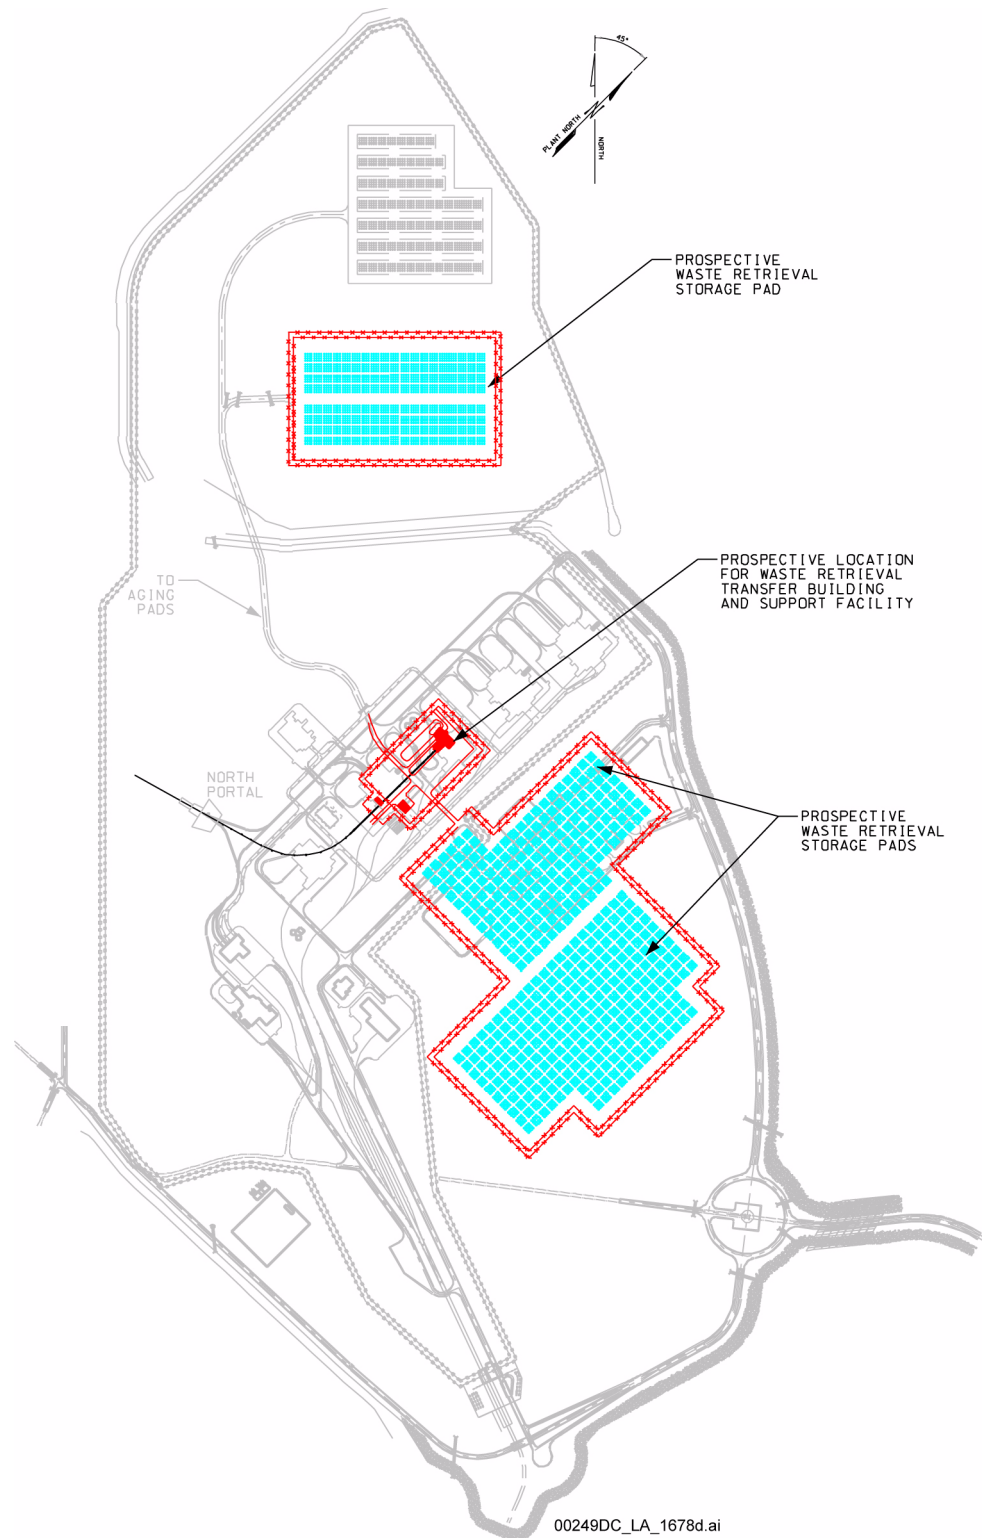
Alternate Storage Facility—Conceptual Layout
